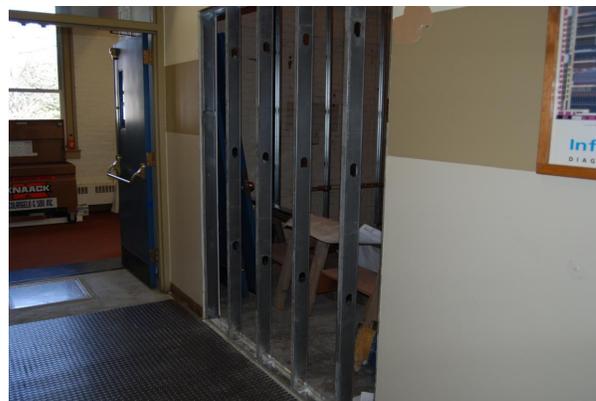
Example of the 16 inch on-center steel stud based construction throughout the Atwater Kent building test location.
